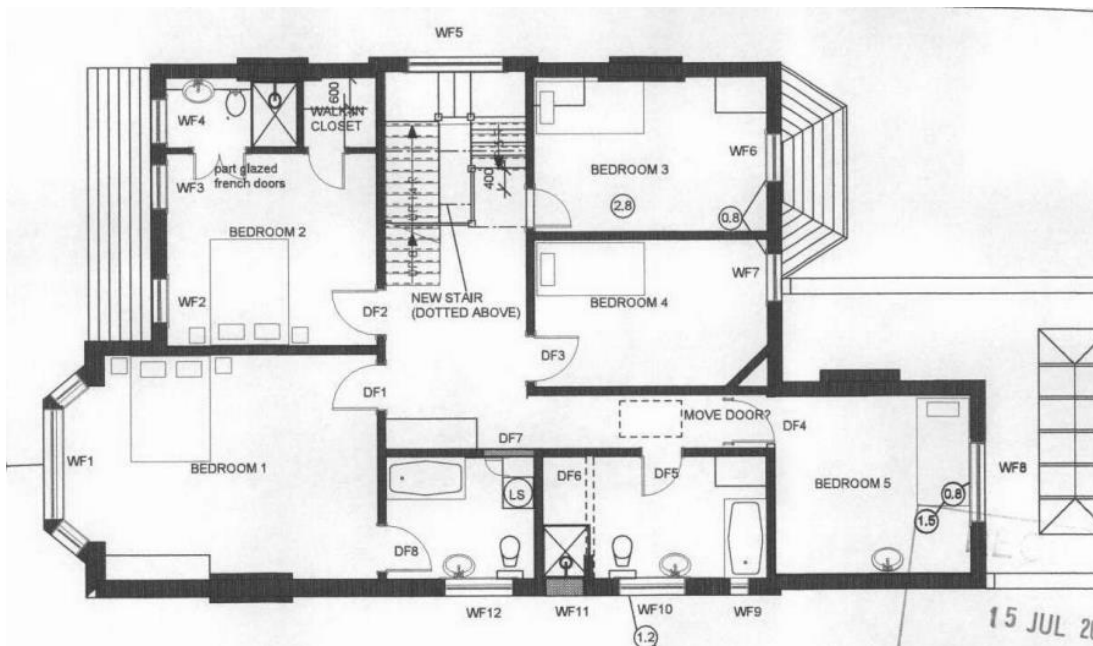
First floor plan of no. 13 Denbigh Gardens granted under application 09/1771/HOT.
